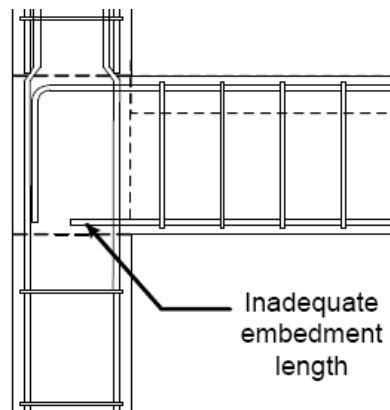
Typical details of inadequate embedment length of beam reinforcement
